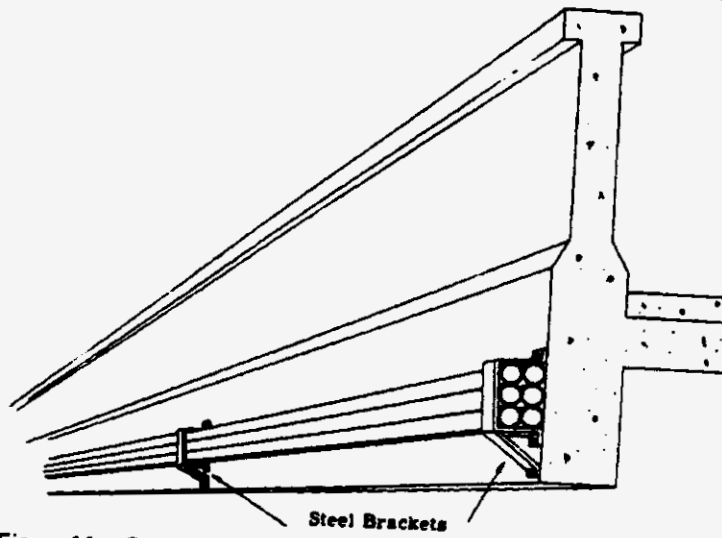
Conduit Run Attached to Side of Bridge with Steel Brackets.
